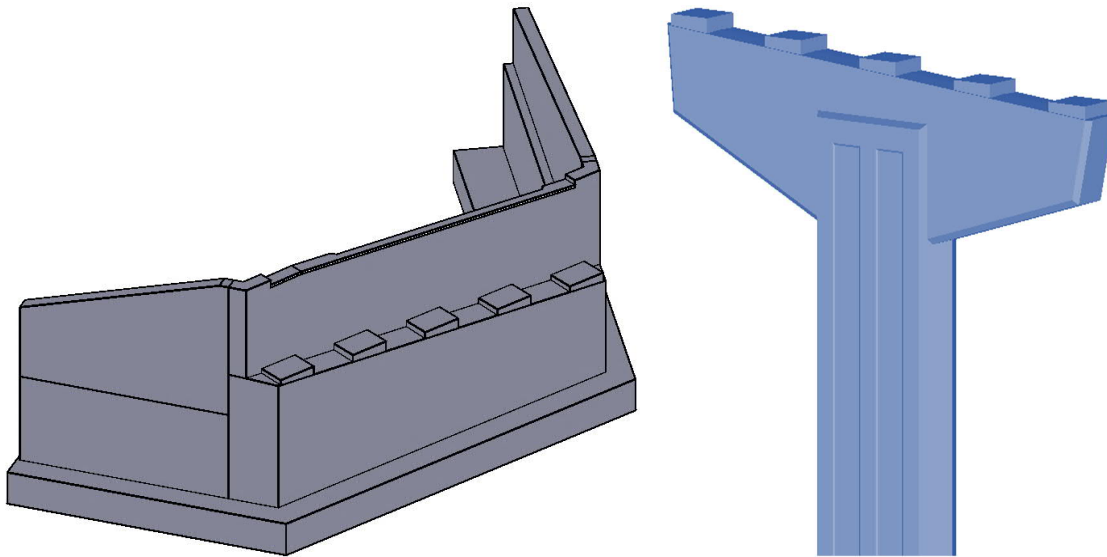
Examples of an abutment and a pier (Soka, 2015).
